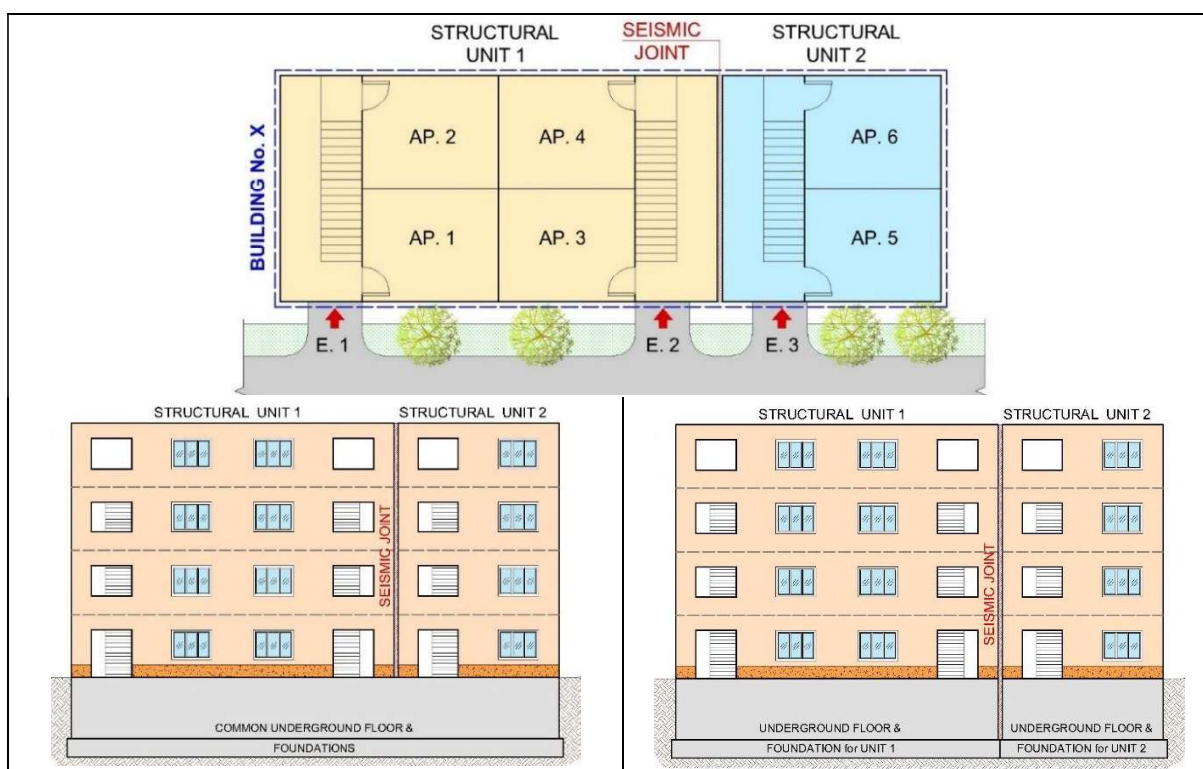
Building with two structural units. Left: seismic joint till ground level, right: seismic joint till foundations
